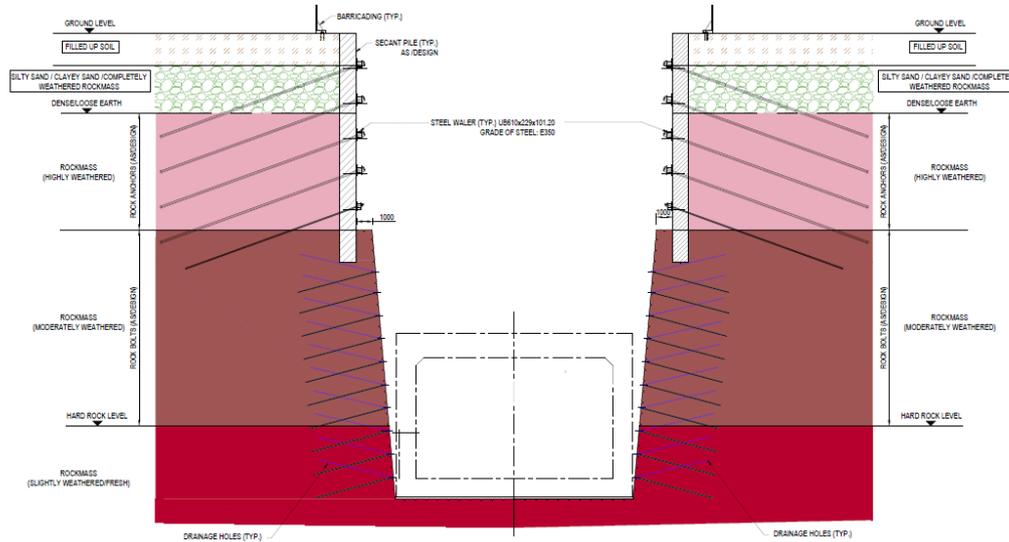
Typical Section of C&C & Ramp with Secant Pile
